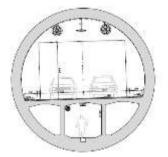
Submerged floating tunnel cross section (Jakobsen et al., 2009).
